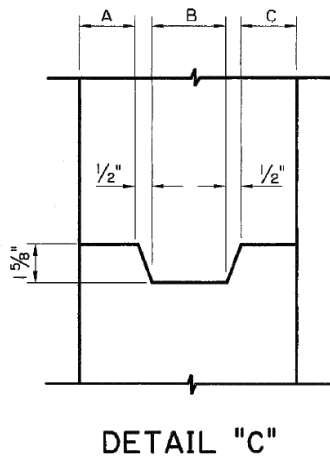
La DOTD Longitudinal Construction Joint between Base and Wall (La DOTD 2008)
